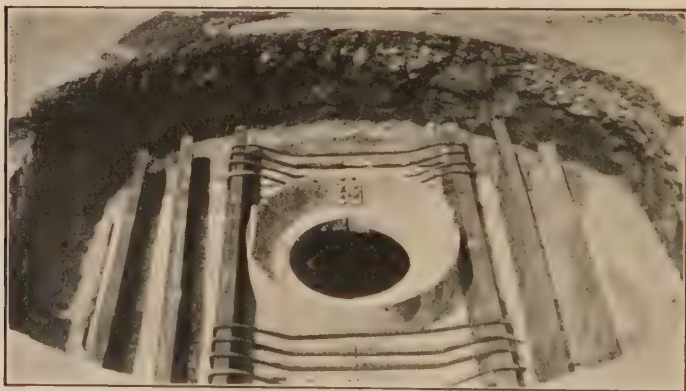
Showing manhole top steel rail reinforcing for concrete.
